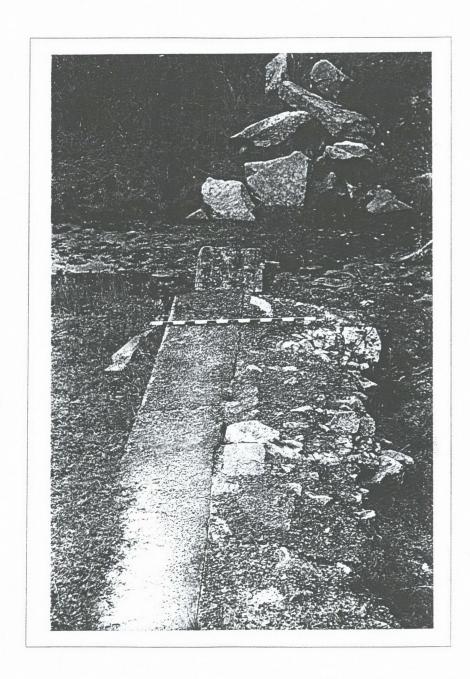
Collapsed deck of Dunduckety Creek Bridge
